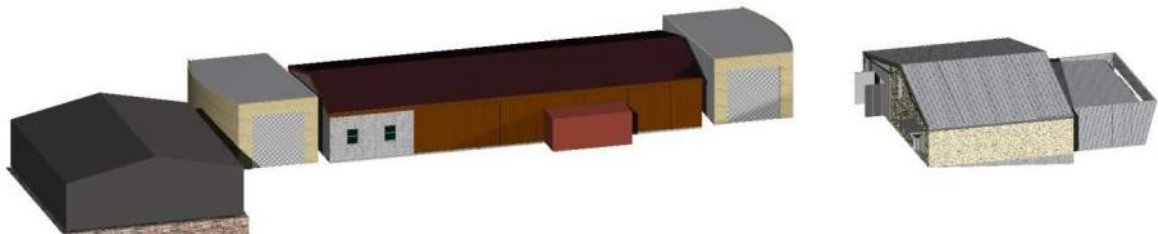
Currently approved development: the existing workshop flanked by two (2) (yet to be constructed) storage buildings (total 44.2m in length, max. width 13.6m, approx 510m²), with the farm building to the south and stone barn to the north.
